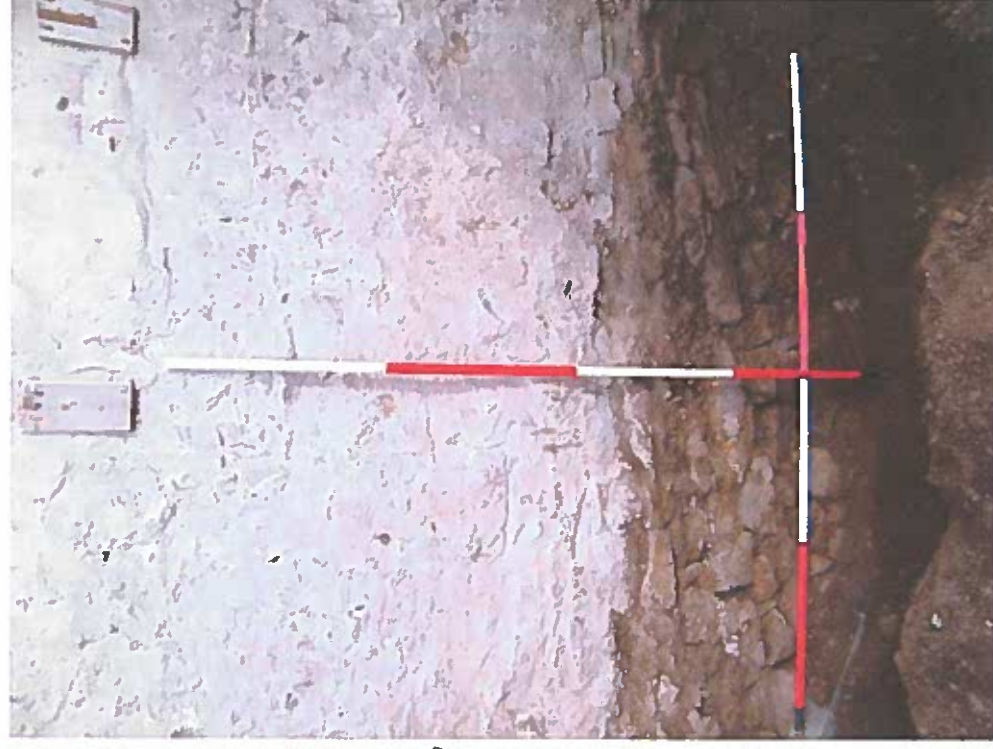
The footing inspection pit along the east wall, south side, from the W
